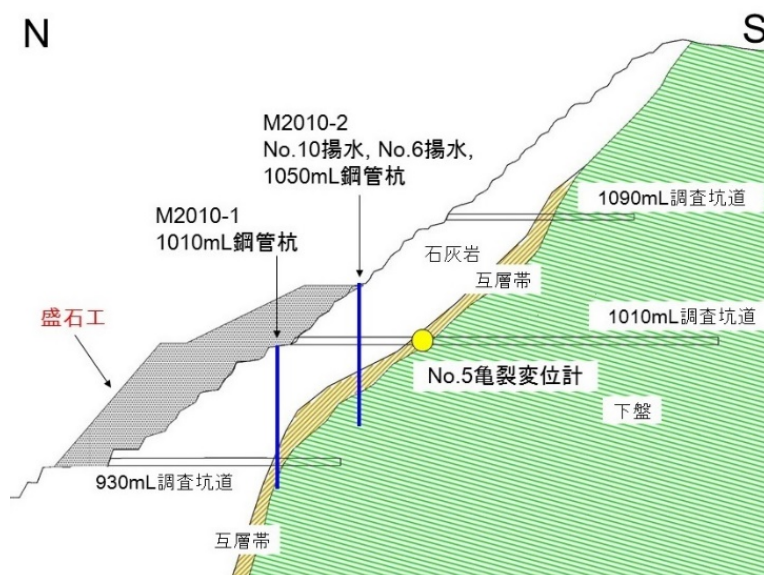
2 Cross section view of monitoring points and the countermeasures.
